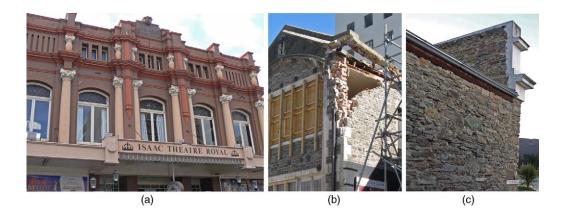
Examples of clay brick and stone URM parapets: (a) clay brick parapet; (b) combination of stone and clay brick parapet; (c) rubble stone parapet.
